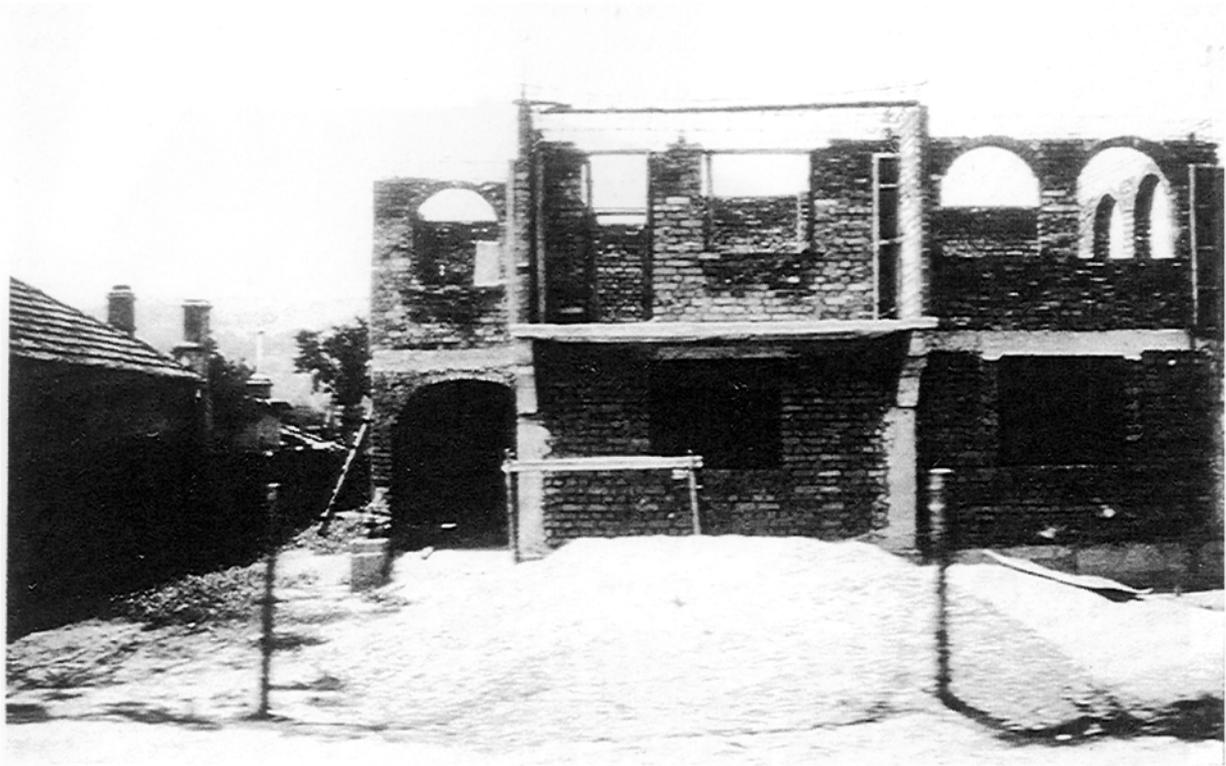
Two storey reinforced brick masonry house. Notice the reinforcing bars in the top floor and columns in the ground floor.
